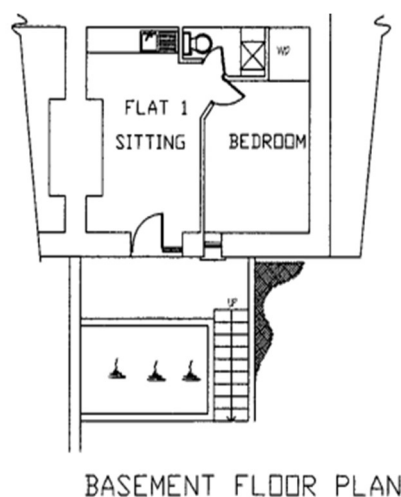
Floor plan of Celia de Jesus's flat (Source: Planning application 3772/11, 2011)
